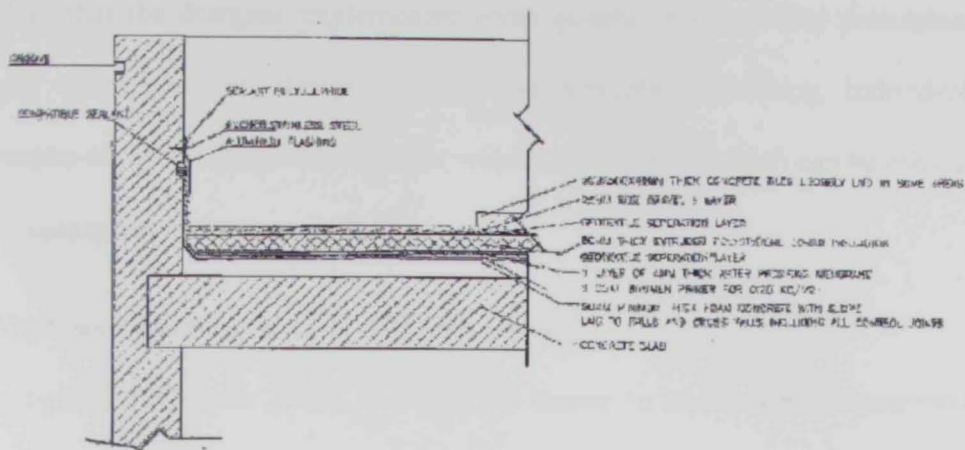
Roofing System in Al Falah Houses (GHM, June 2009)
